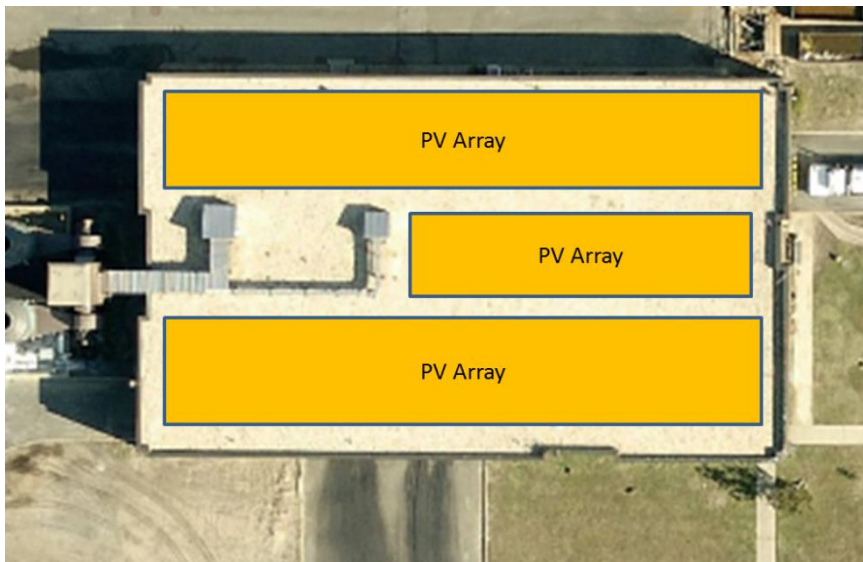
Roof of South Eastern building with possible PV array arrangement.
